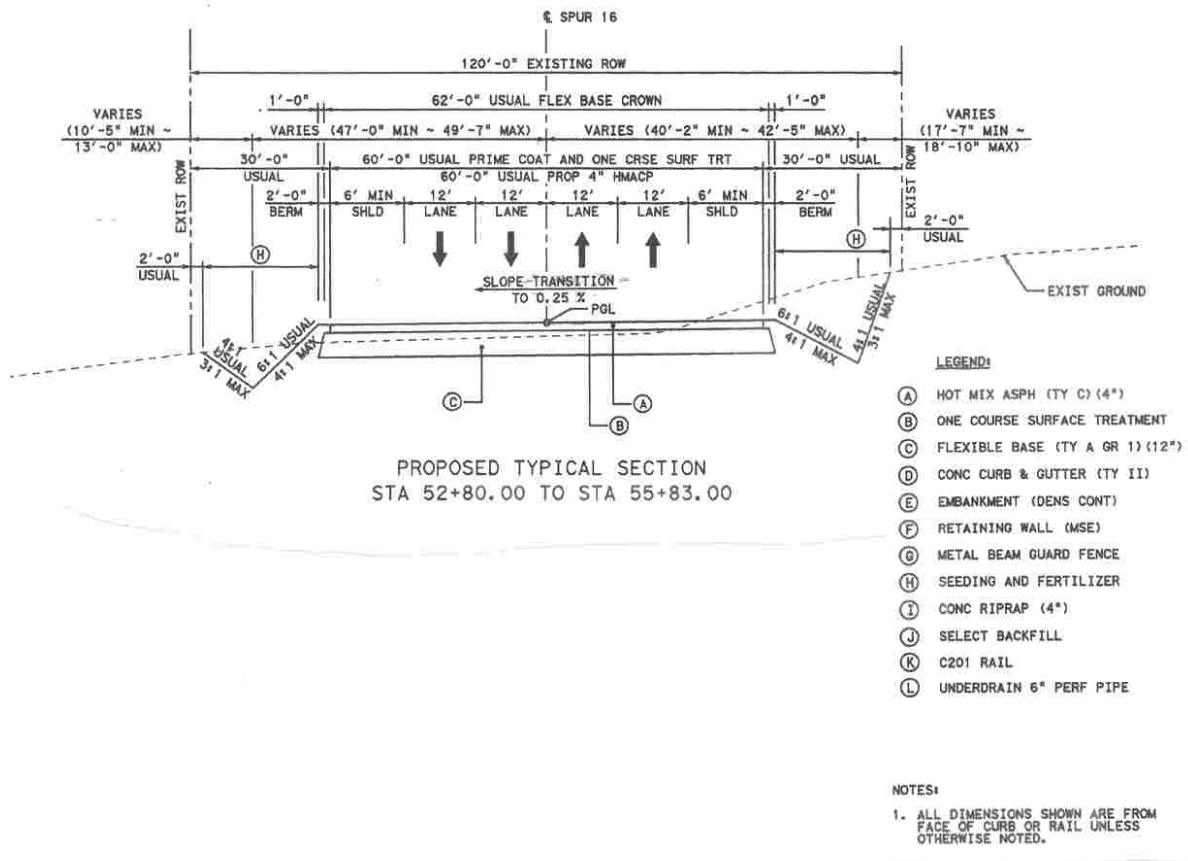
Cross Sectional View of Plans for the Second Street Project.
